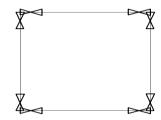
Position of Bracings in Flat Slab Building With CnSWEb
